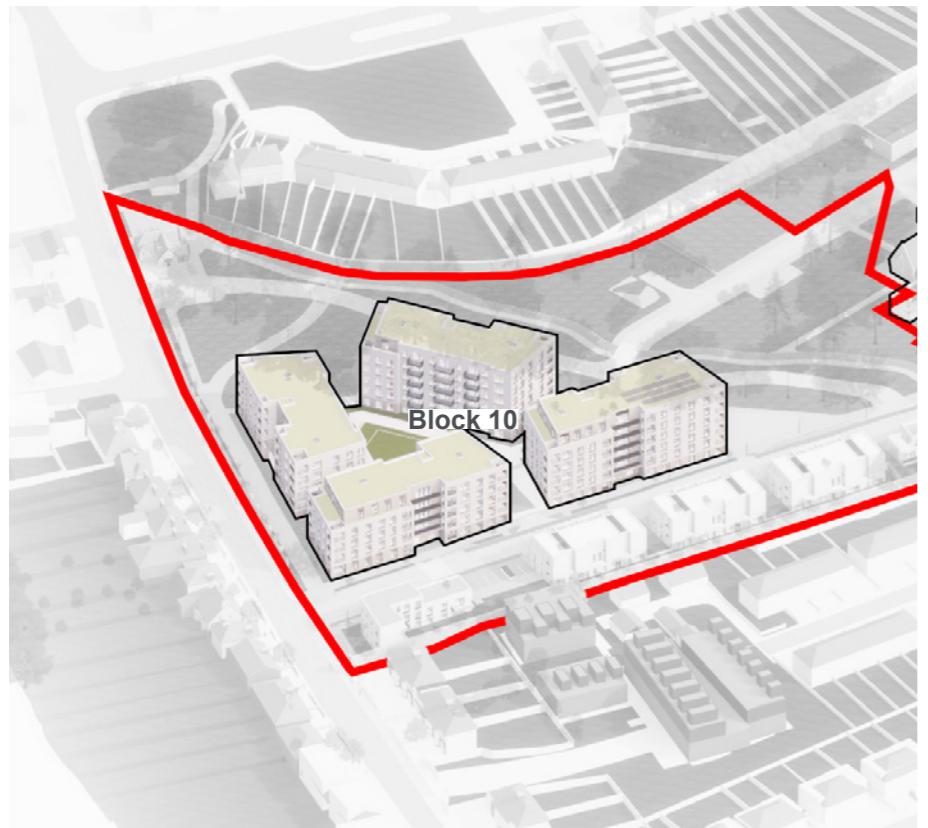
Landscaped route between Block 10 and the boundary wall at Dundrum Road
